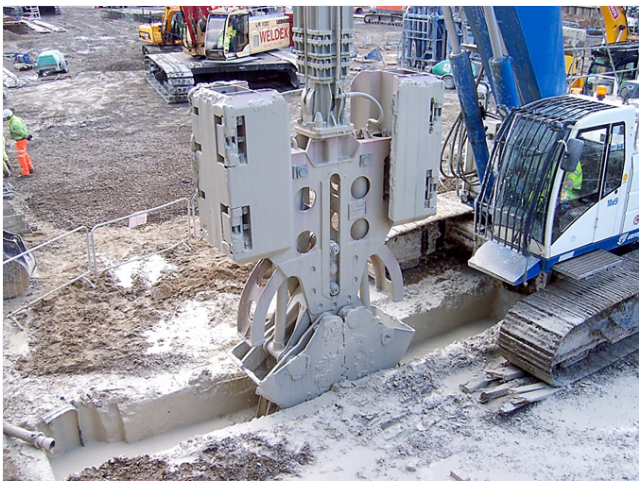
A diaphragm wall trench filled with bentonite clay slurry
